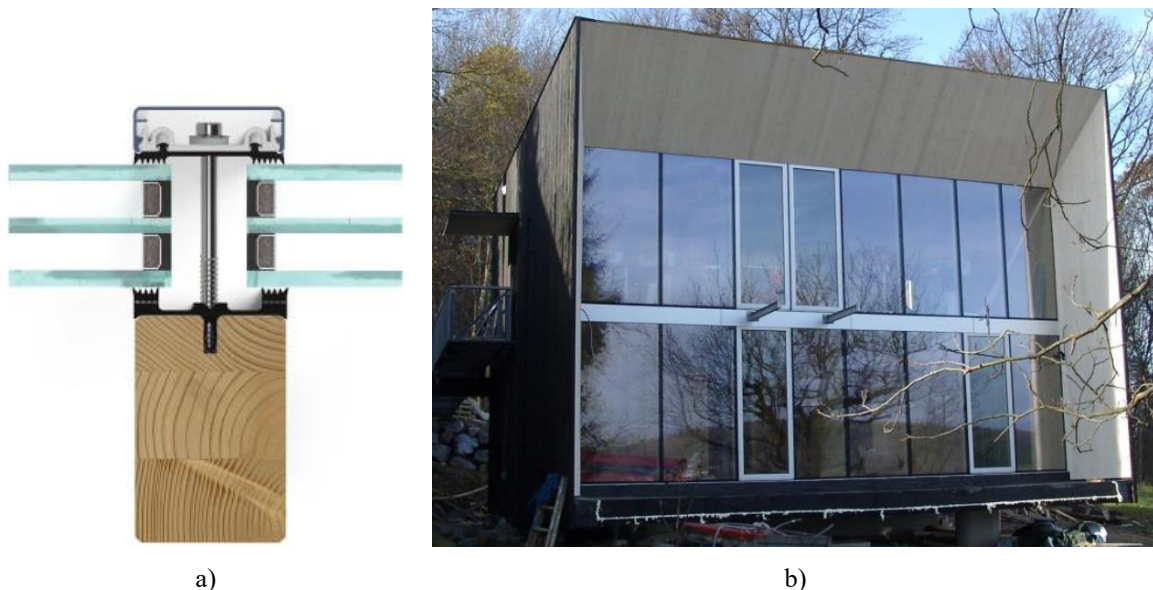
Examples of timber-glass facade solutions: a) typical cross-section of curtain wall detail ([www.stabalux.com](http://www.stabalux.com)); b) adhesively bonded framed panels according to (Neubauer, 2011).
